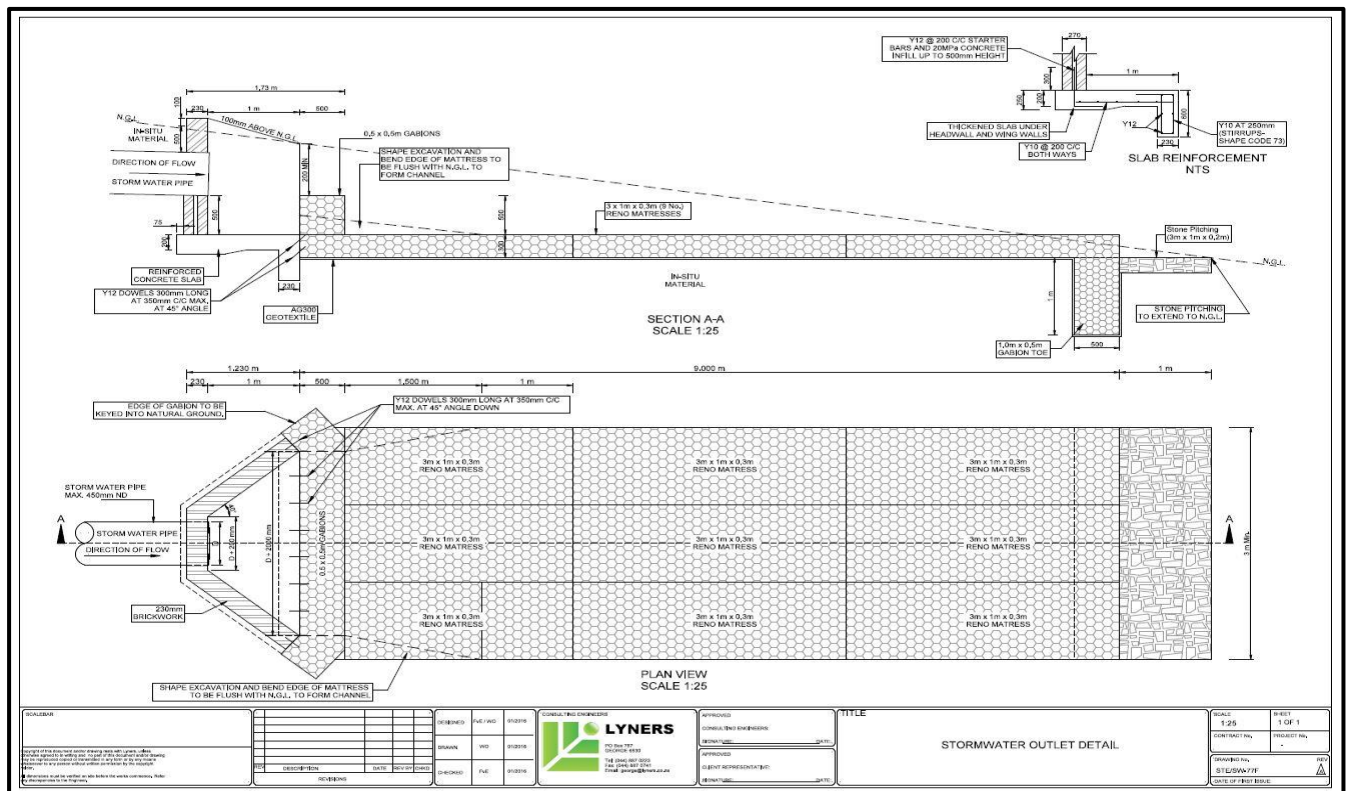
Stormwater Outlet Structure Design Drawing 2.
